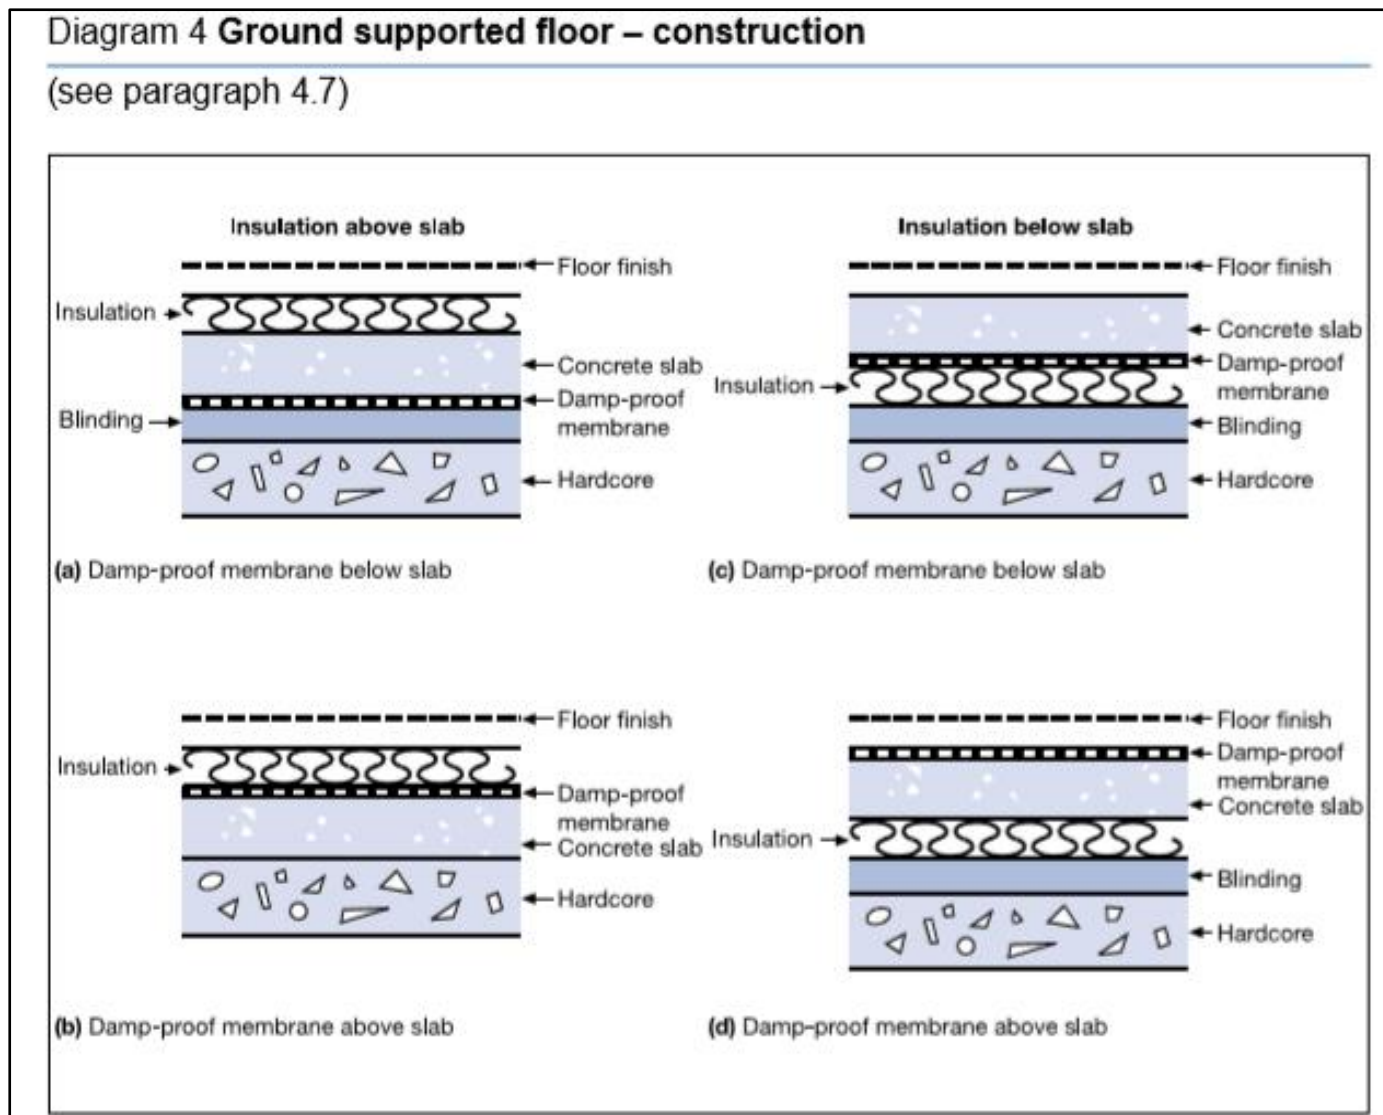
Ground supported floor construction diagram in Approved Document C (Source: www.gov.wales)
